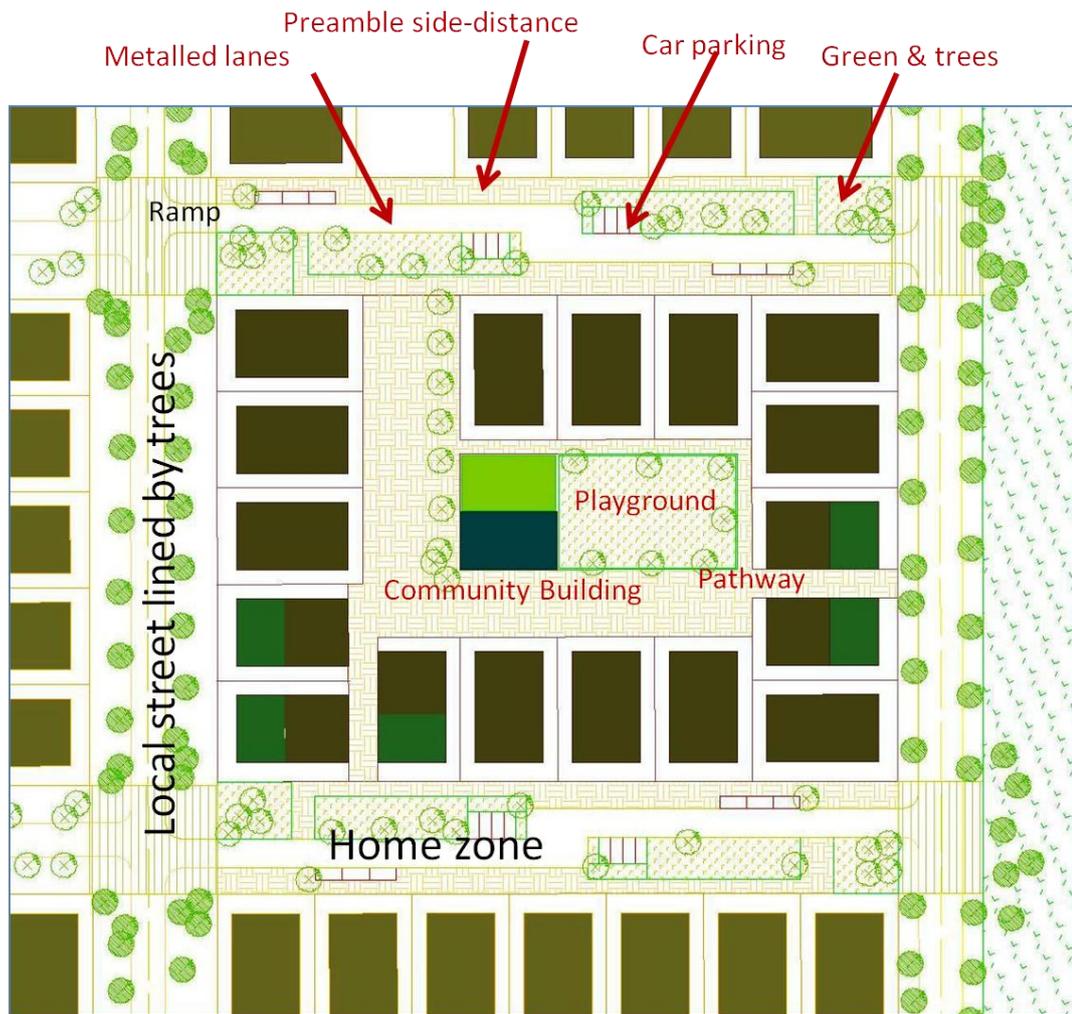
24: Detailed Plan - Proposed Scheme, El-Muchkar-II
